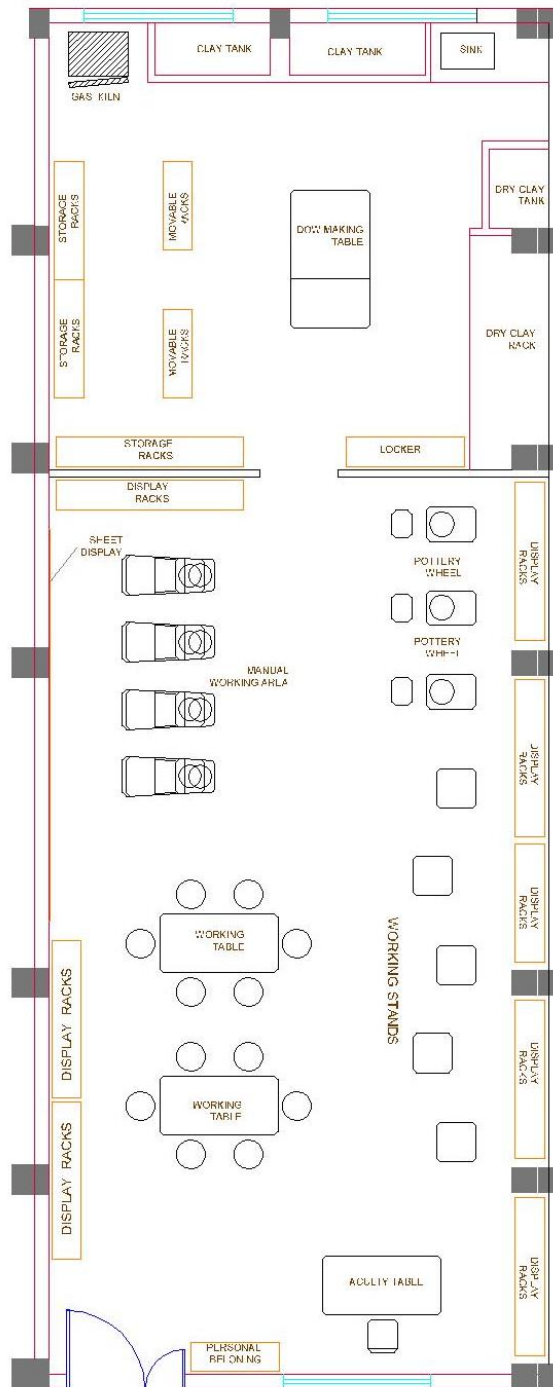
it shows the working layout of the workshop and placement of the furniture and circulation area.
